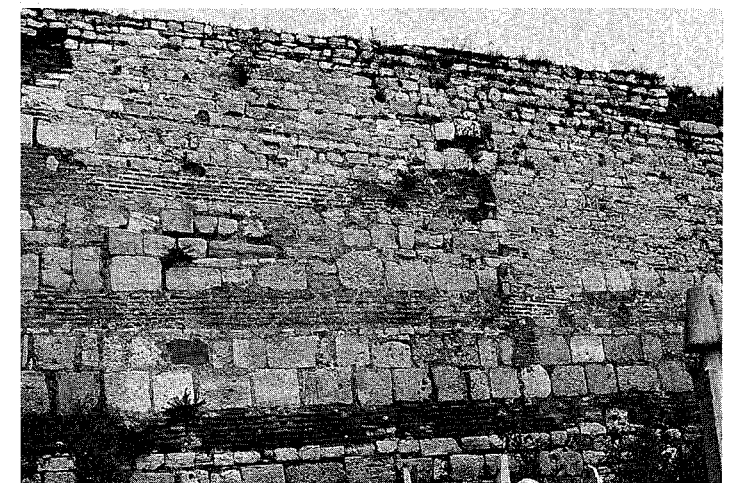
T96, north and east faces: banded masonry [C7], XI c. (?) and alternating brick [J2]
